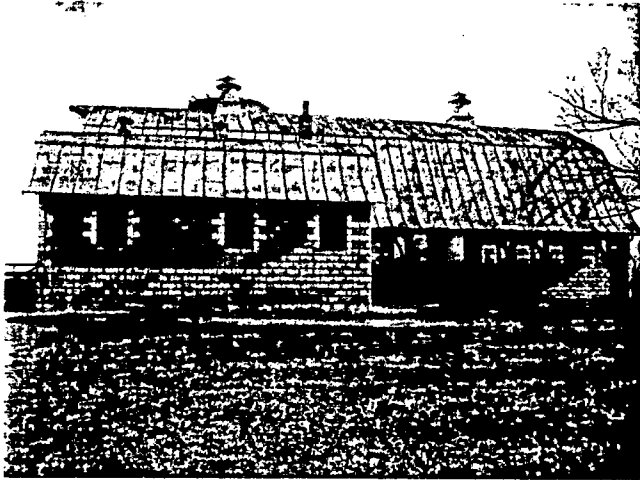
View of Zeigler Dairy Barn (1930s-40s) with barn and milk house. Parks Central Maintenance has recently repaired structural cracks at milk house corner. No work planned other than routine maintenance.
